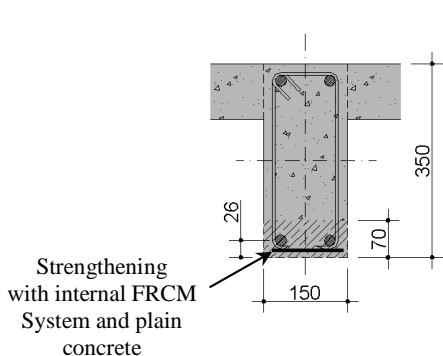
Strengthened cross section with FRCM System and plain concrete
